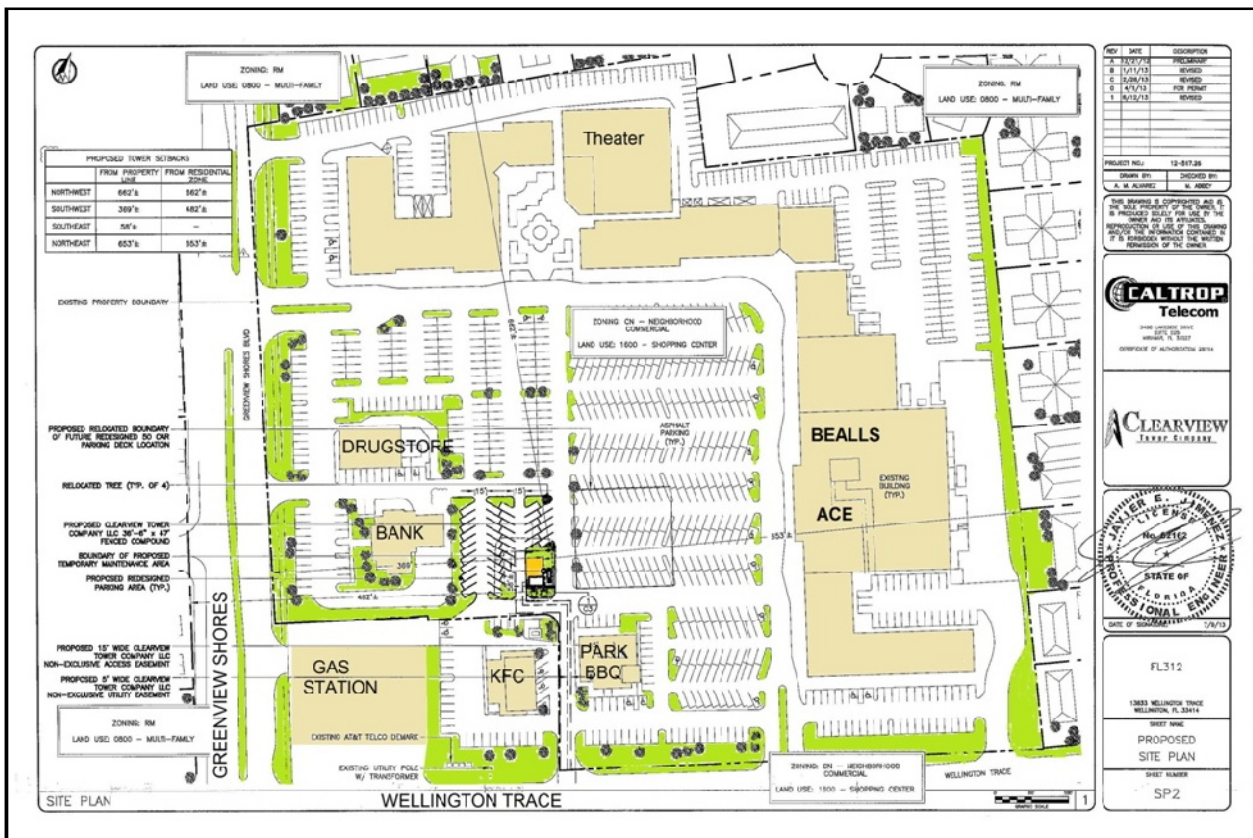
A portion of the “site plan.” The parking area would be redesigned in the vicinity of the compound to provide for angle spaces. Interestingly neither the site plan nor the survey picked up the replacement of the building marked “drugstore,” which was actually a fast-food restaurant, with a real drugstore. Its footprint is considerably larger than the former building.
